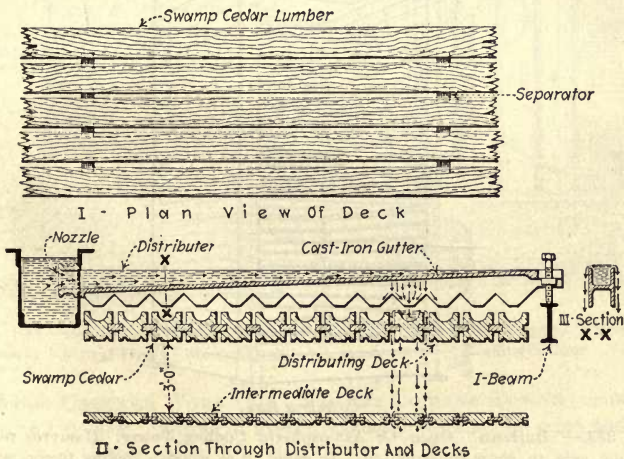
Distributor And Decks Of “The Cooling-Tower Company” Design. (Each tower contains 10 intermediate decks arranged one above the other.)
